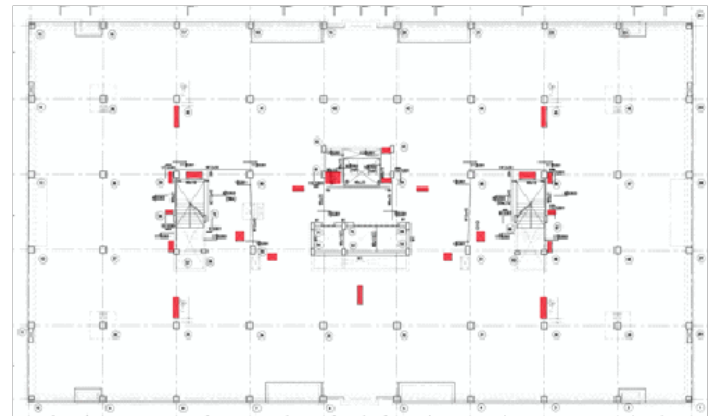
New slab cut locations for ductwork only. All plumbing fixtures require penetration
